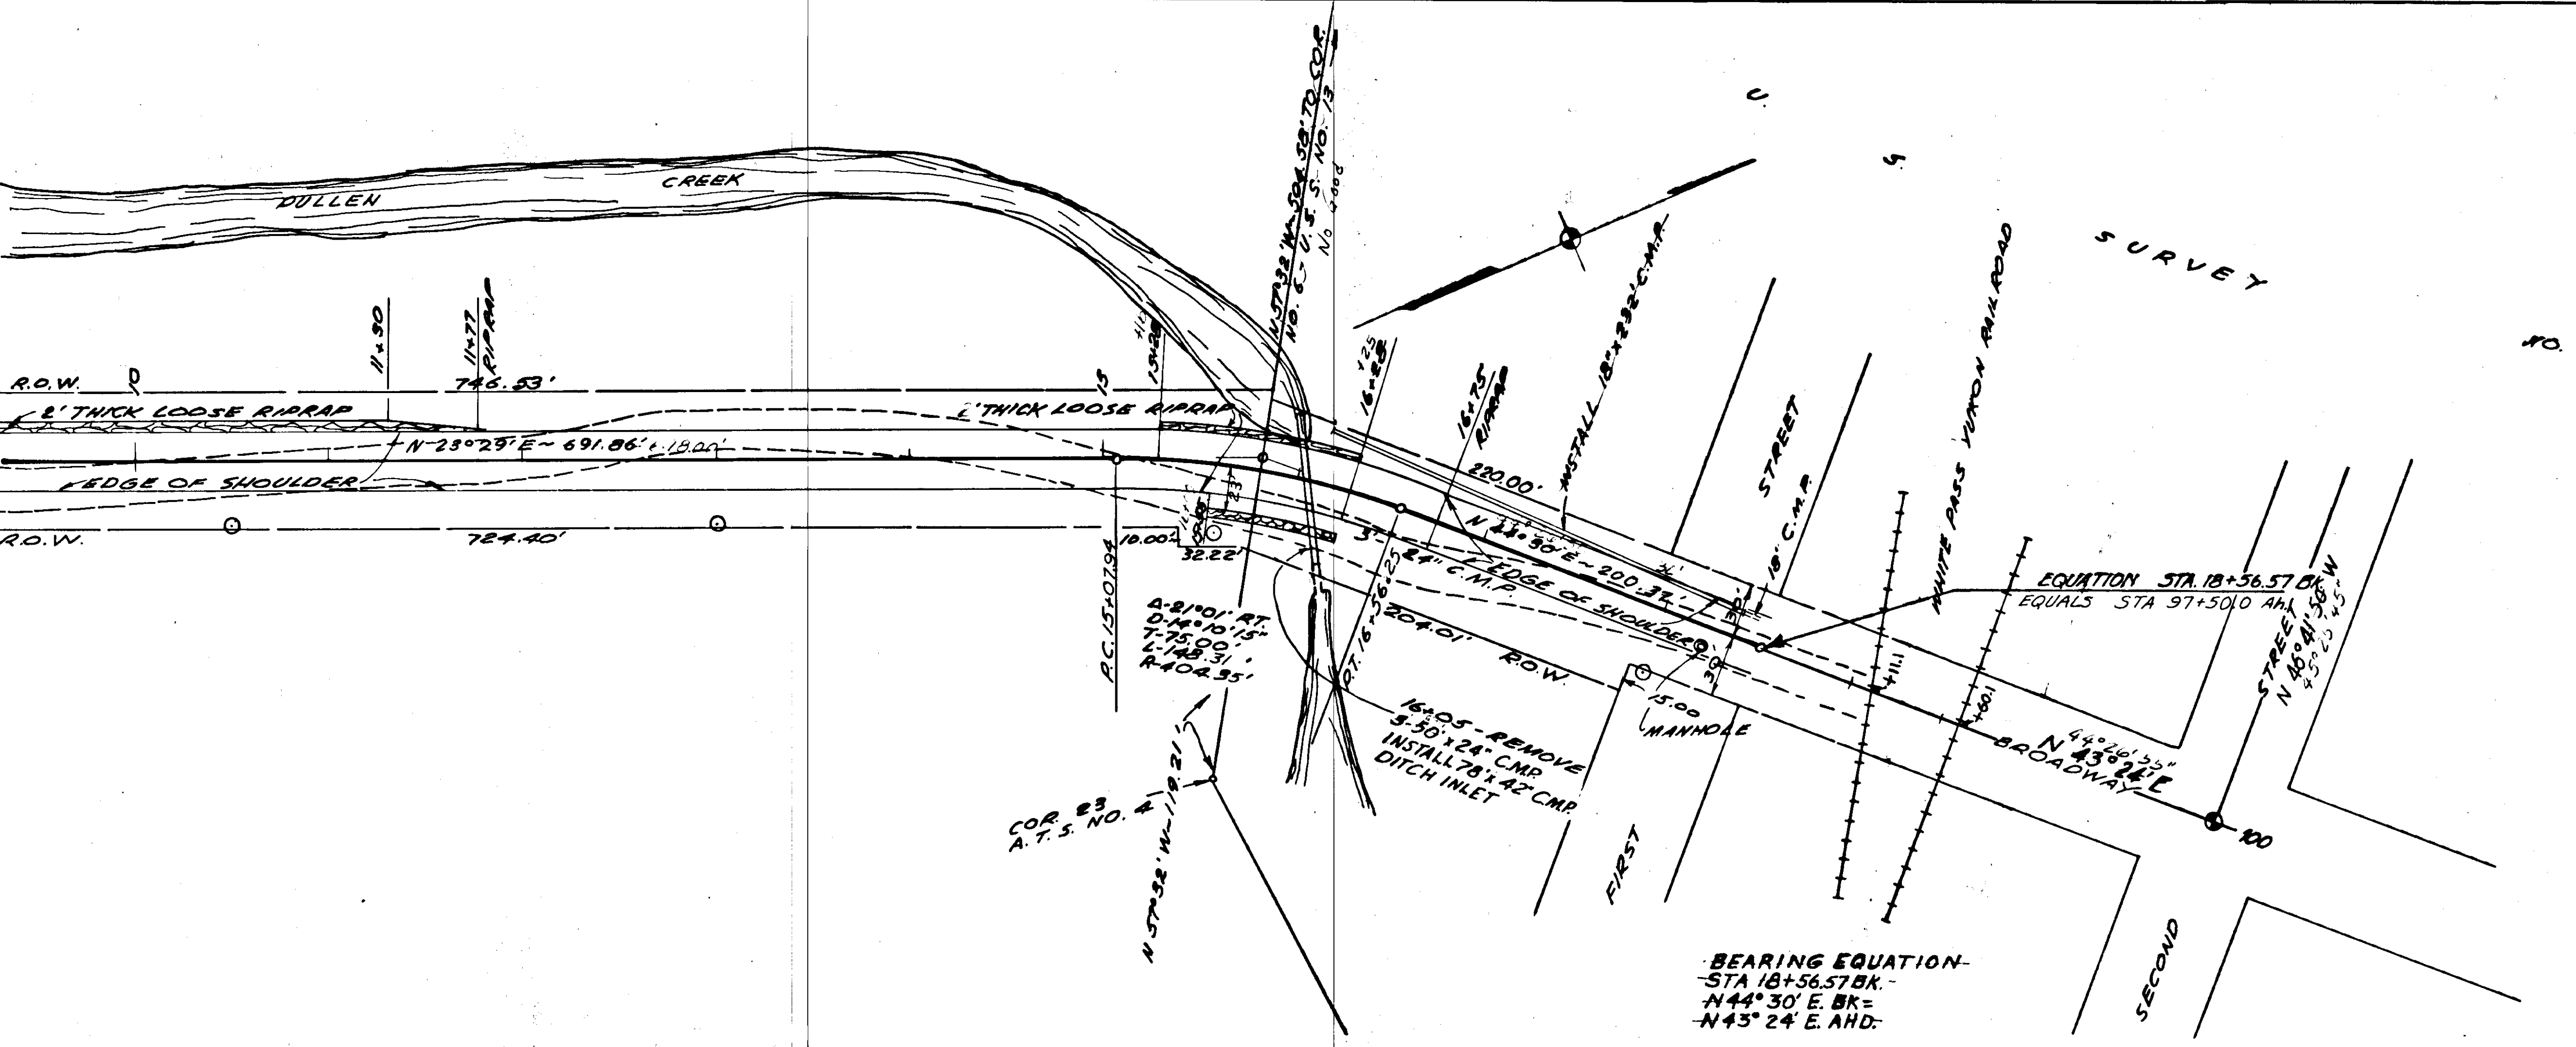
PLAN - PROFILE O.P.R.A.R. STANDARD
